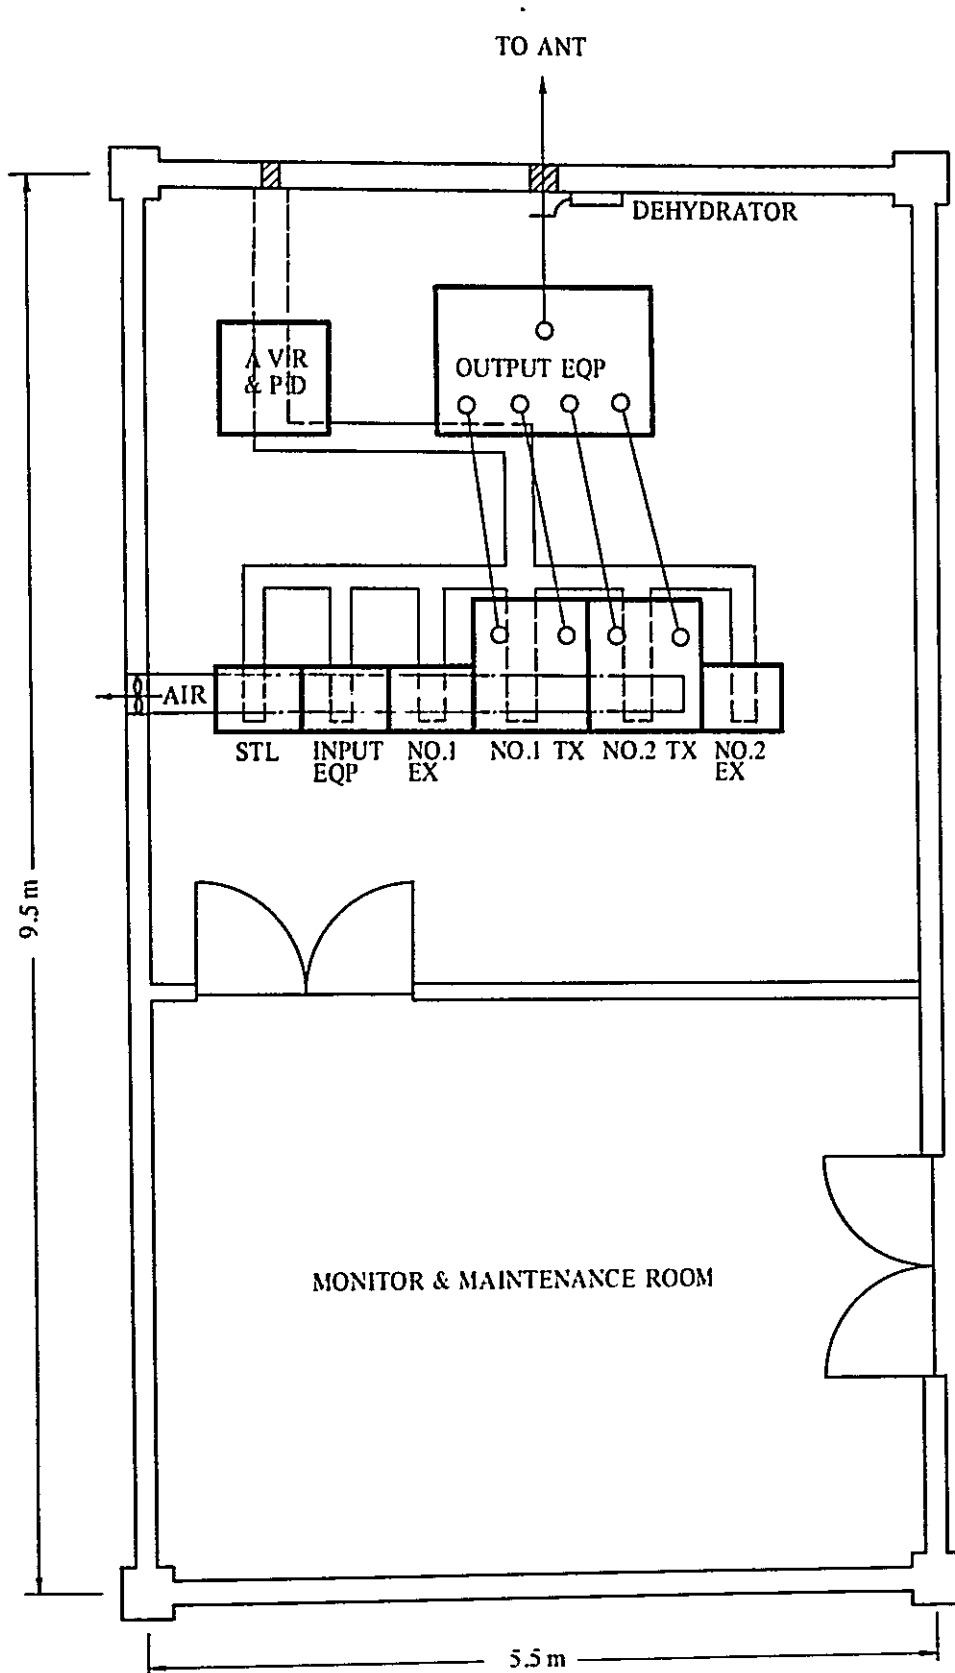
Floor Layout of VHF 1~2kW TV Transmitting Station
